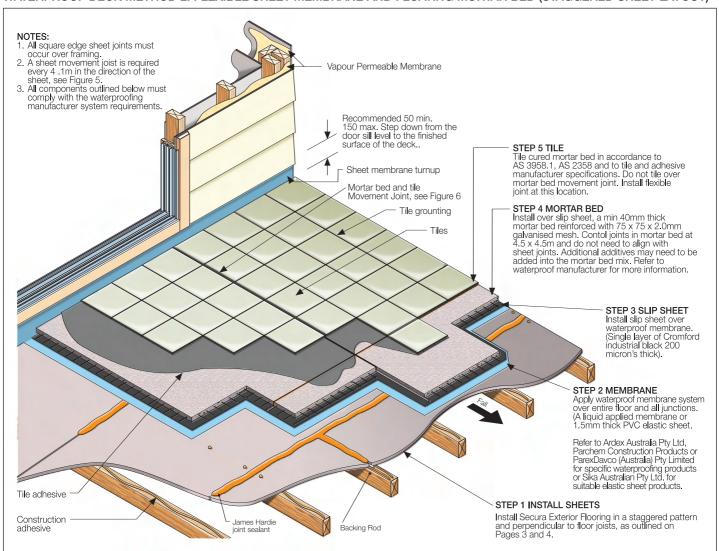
METHOD 2 - SYSTEM INSTALLATION
